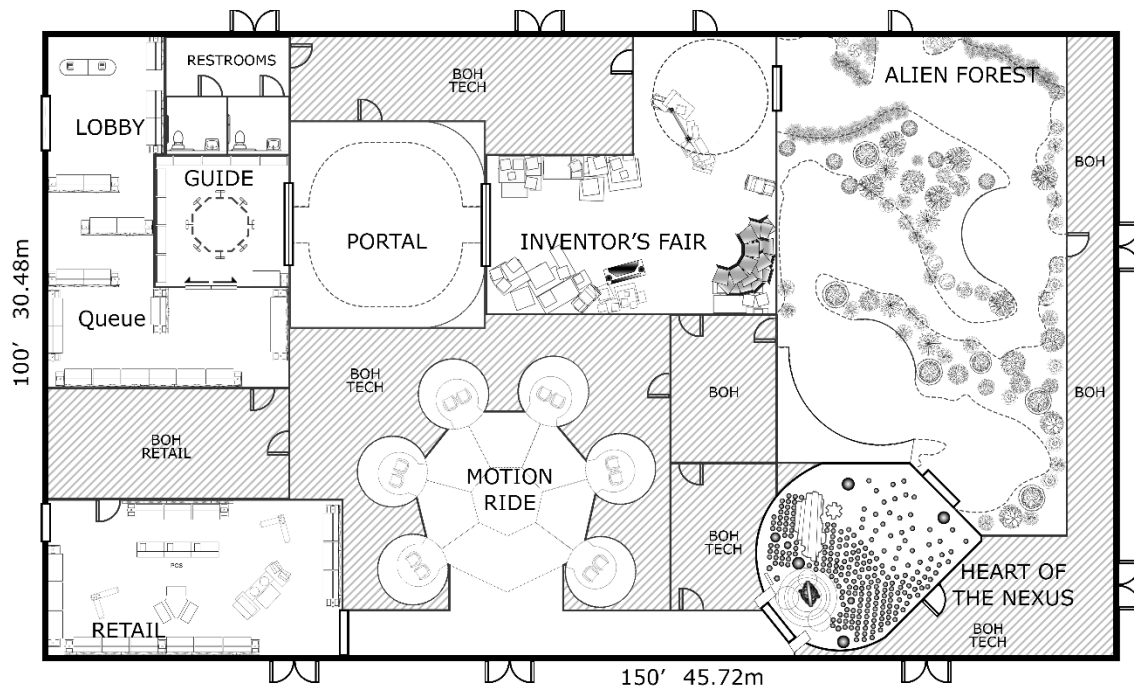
Floorplan of The Nexus, Zones. Original Diagram: McGowan, 2025
